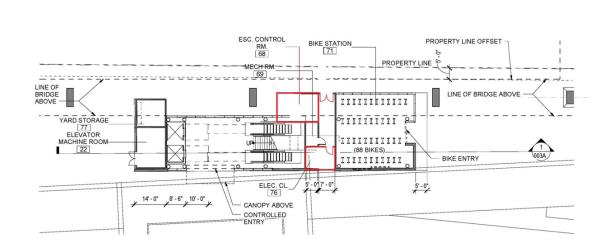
First floor plan of entrance pavilion, endorsed by BAR in 2016
